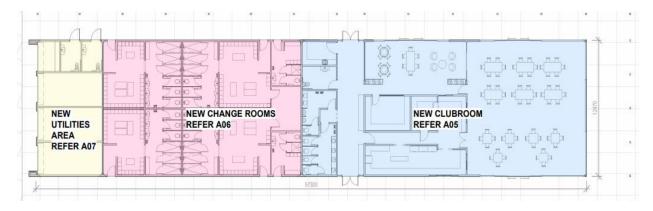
Concept Floor Plan for Kalara Reserve Changeroom & Clubroom
